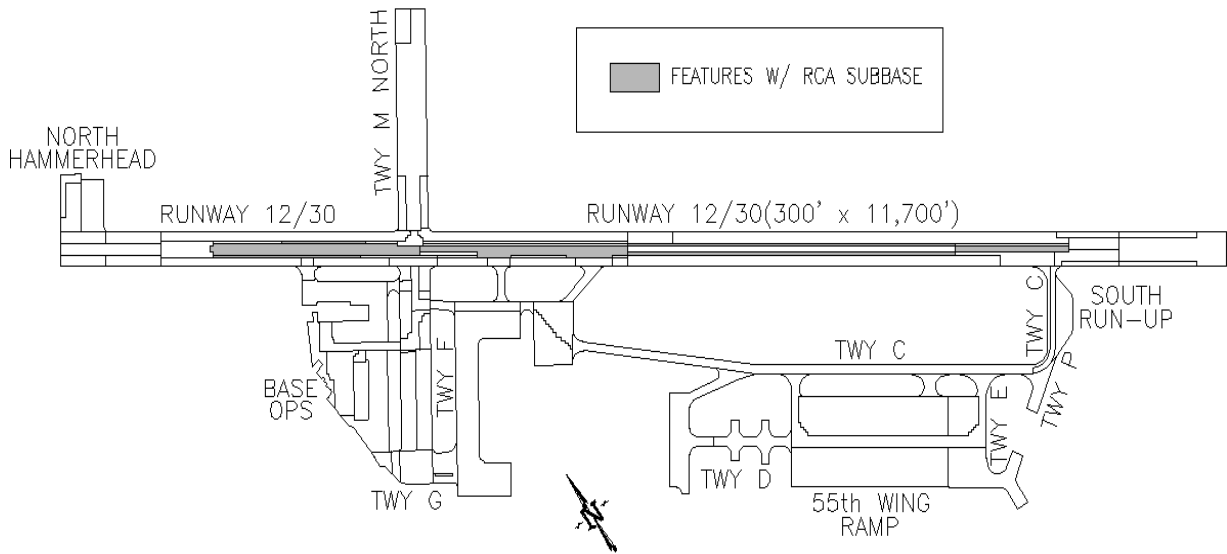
Layout of airfield pavements at Offutt AFB.
